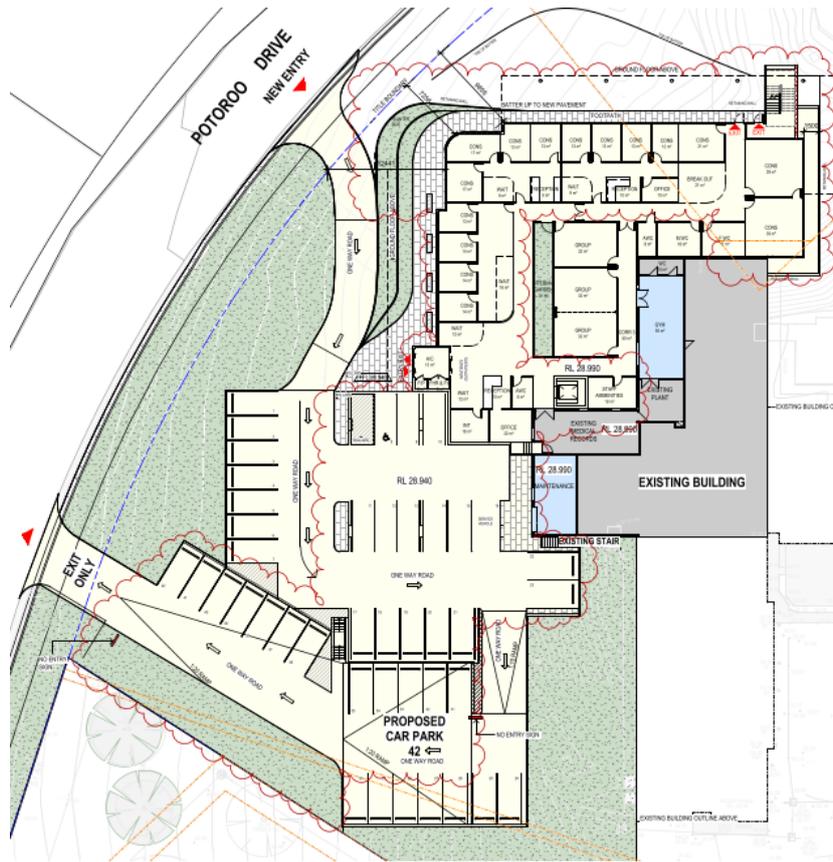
Proposed Ground Floor Additions - Mental Health Ward (source: HSPC)
